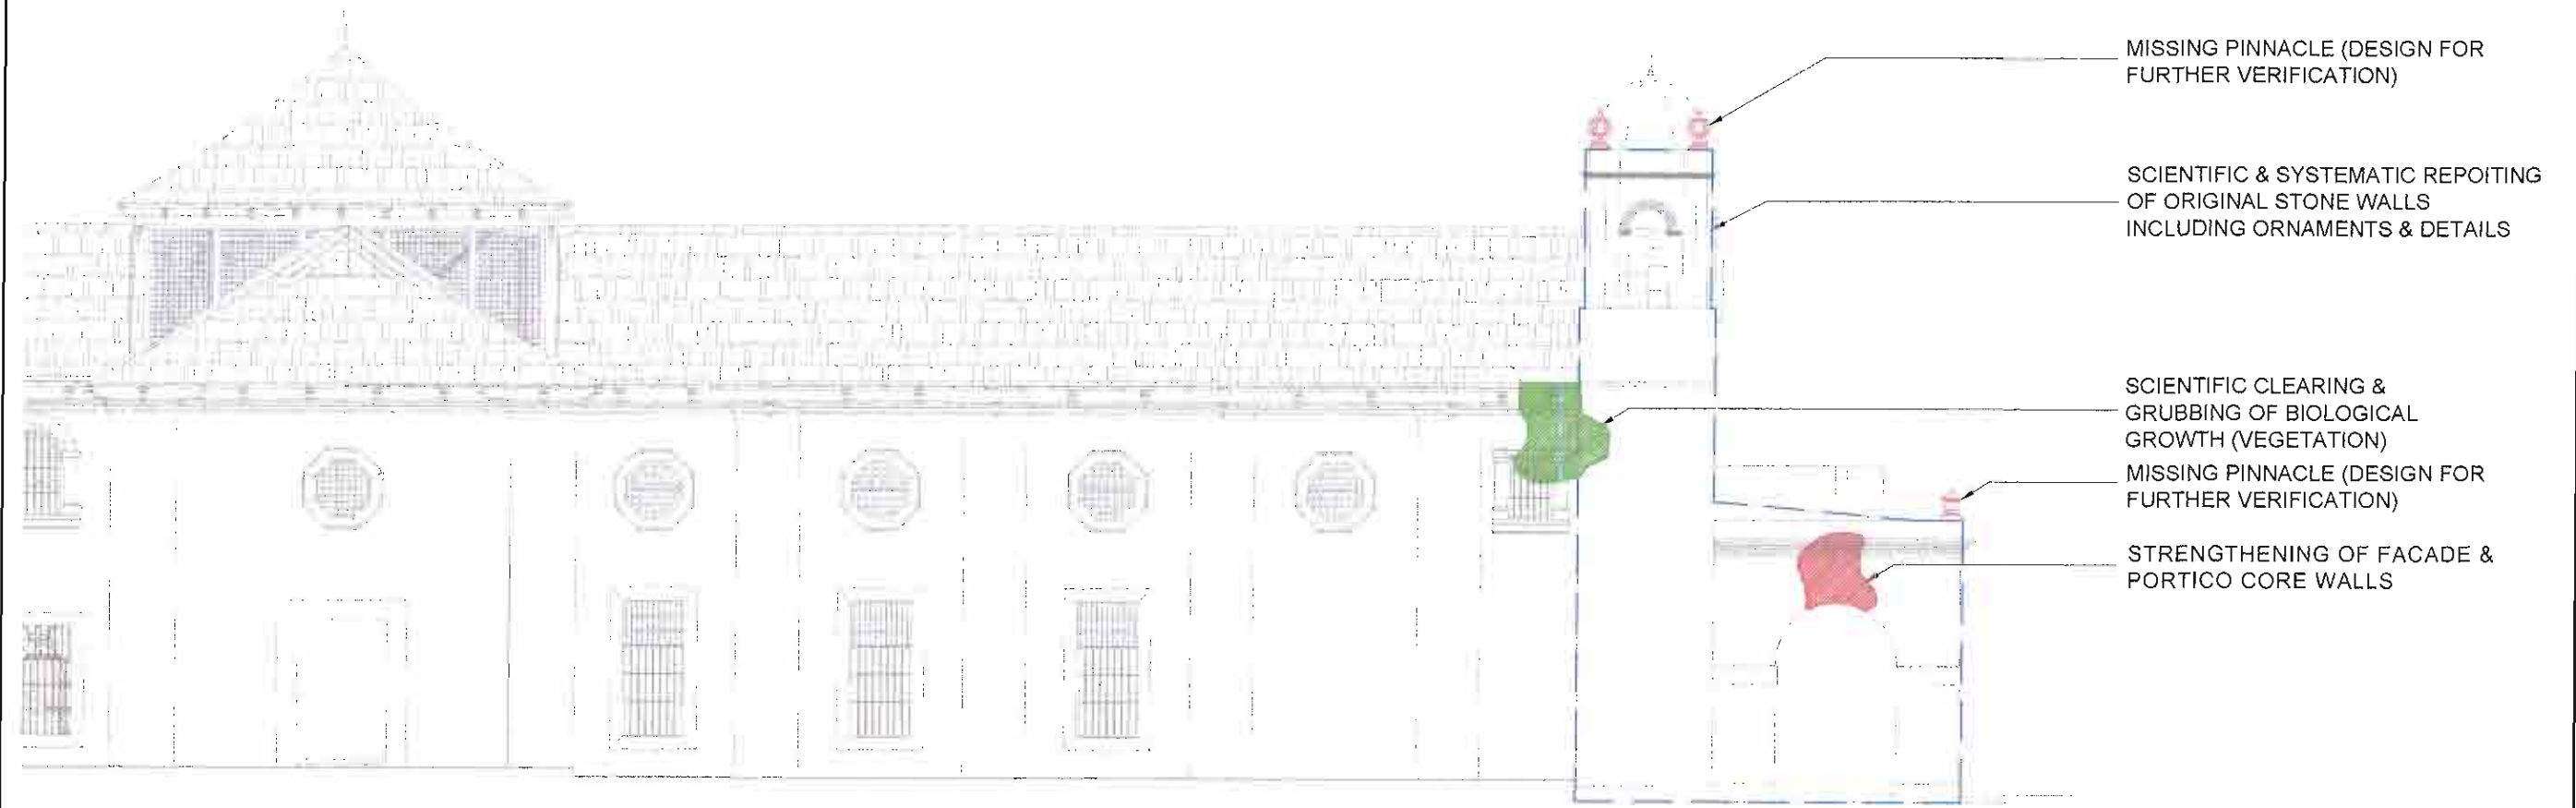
RETROFITTING OF ARCHED OPENINGS AND FACADE WALL
